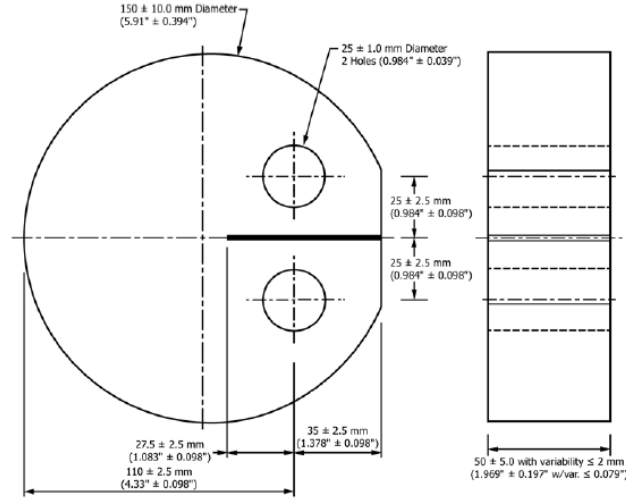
ASTM Standard DCT Specimen Dimensions (ASTM D 7313)
